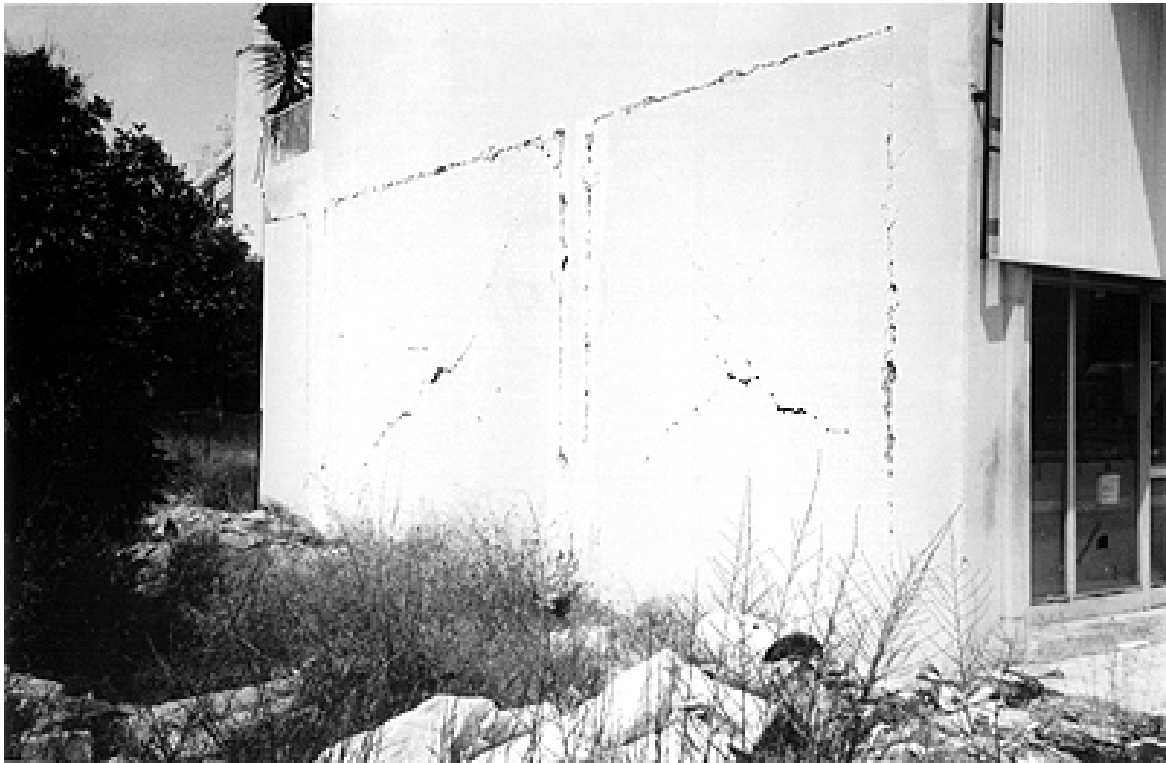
Cracking and separation of brick infills of R/C building (GREEN)
